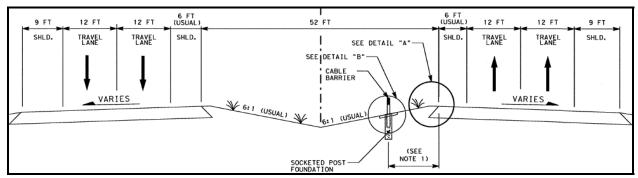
Example Typical Section from Online Plans for Extraction of Roadway Data.
